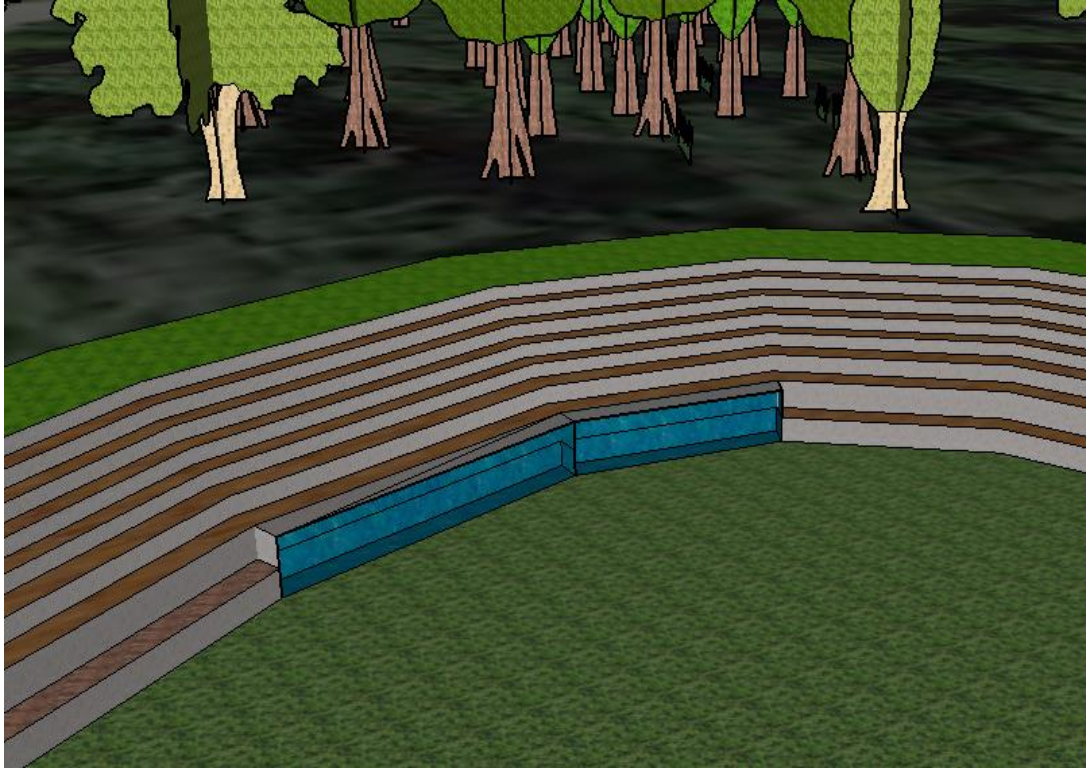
Outlet Design Lateral View (Dry Pond Facility)
